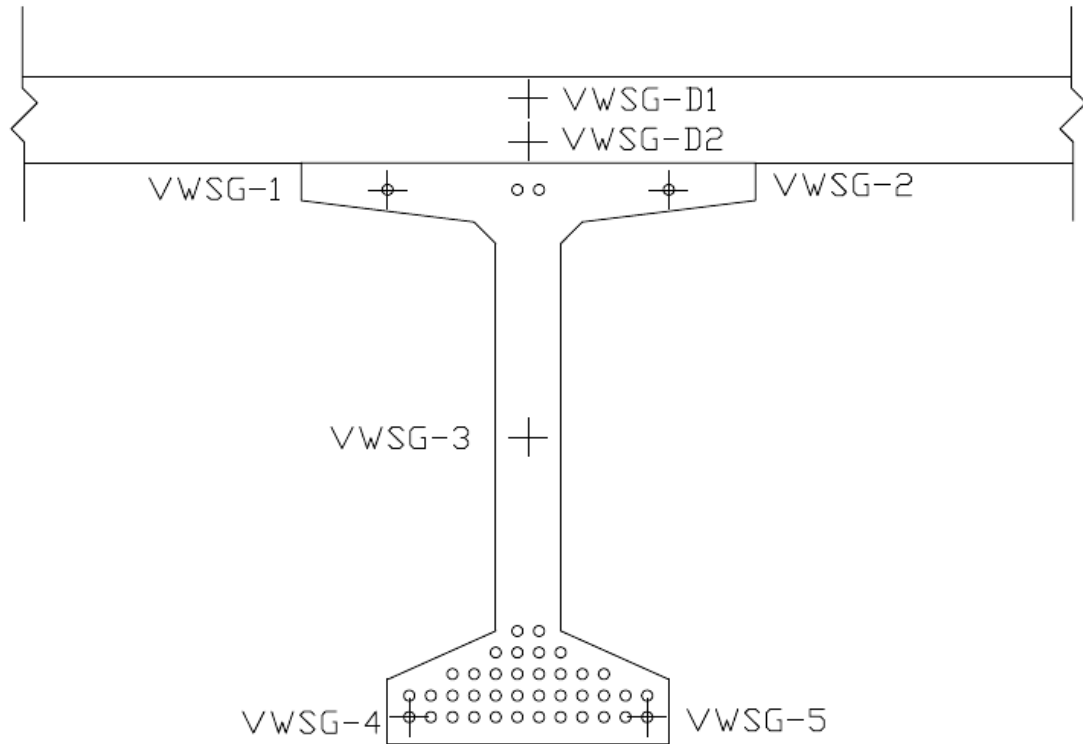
VWSG locations inside BT-54 girder and in deck above
